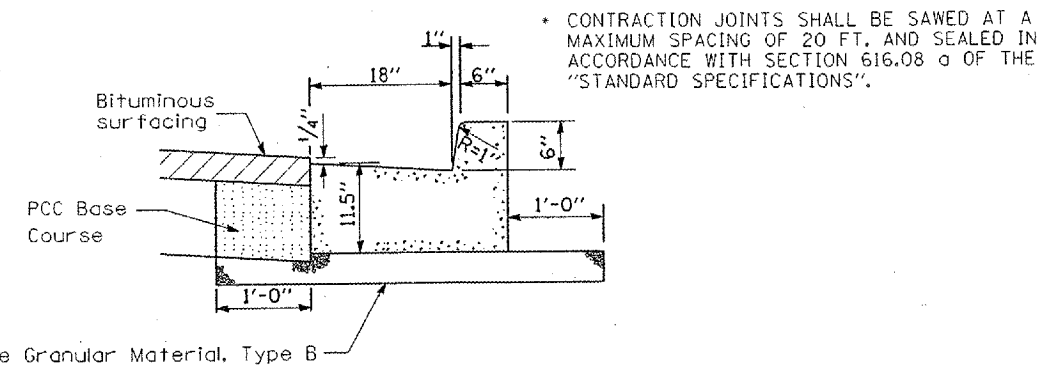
DETAIL CURB AND GUTTER INLET EXPANSION JOINT
